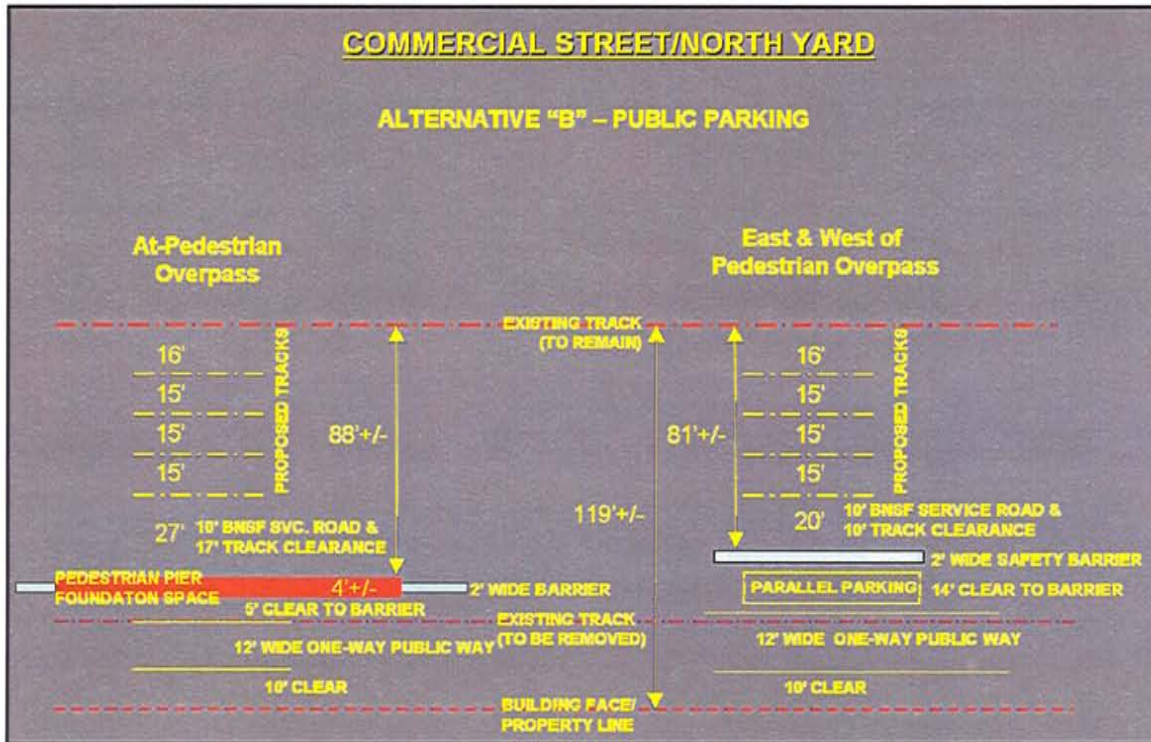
BNSF North Yard/Commercial Street Alternate "B"
